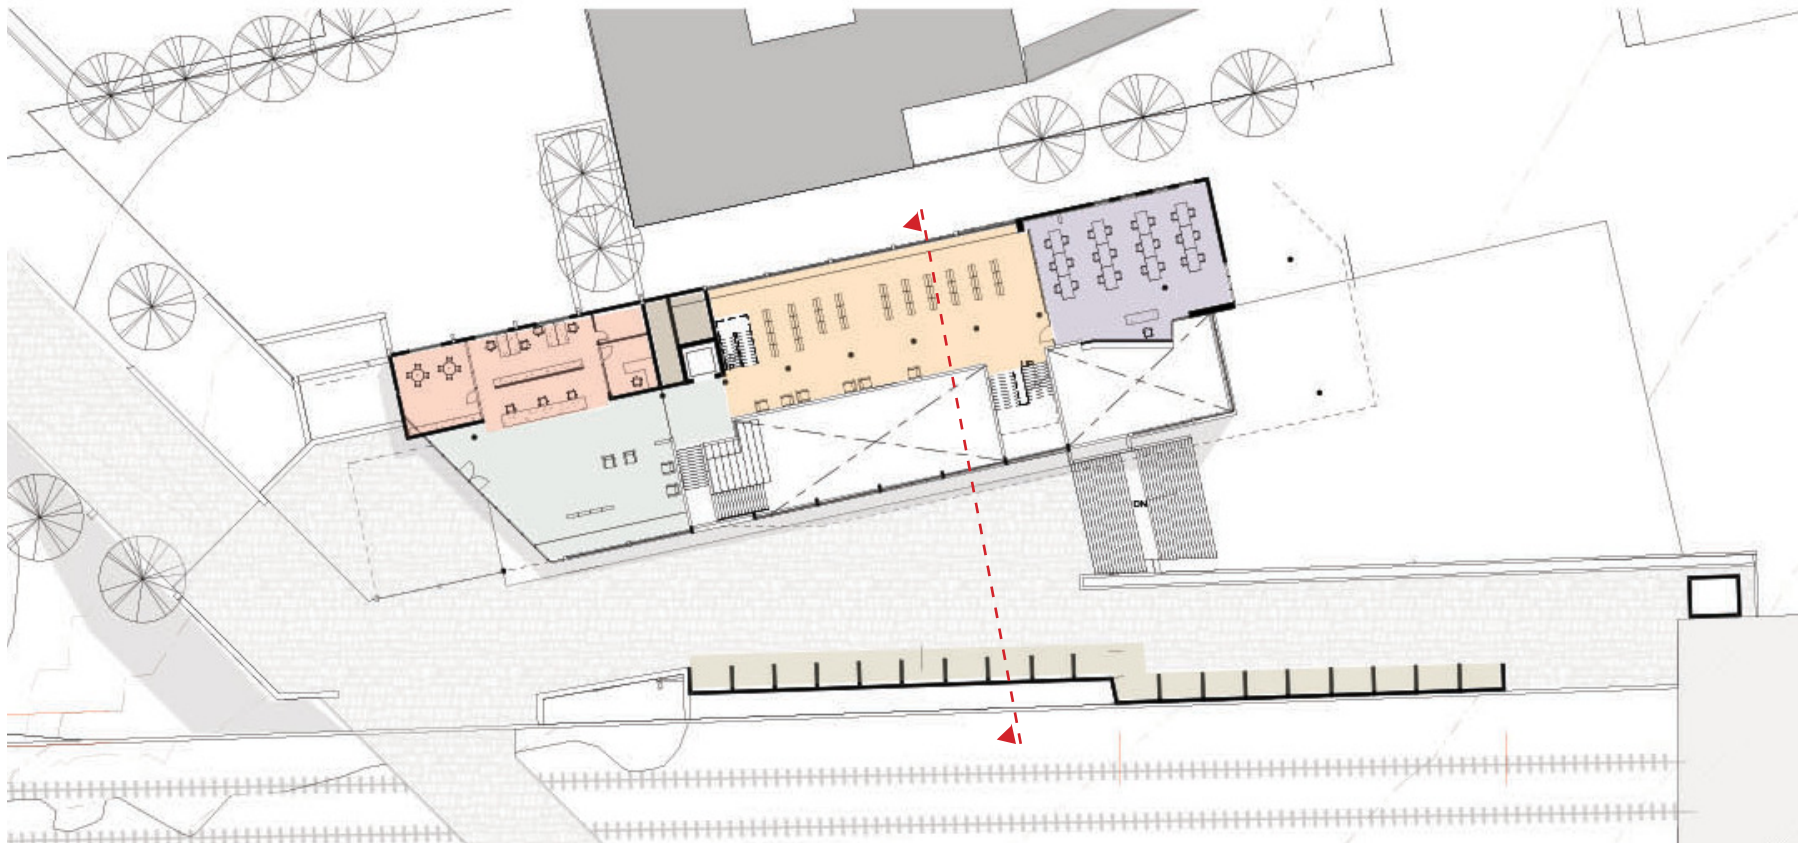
Floor Plan - Level 0 (Author, 2019)
